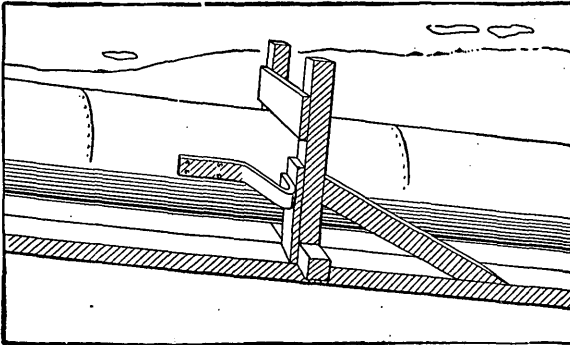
Method of bracing hydraulic pipe on steep slope.
